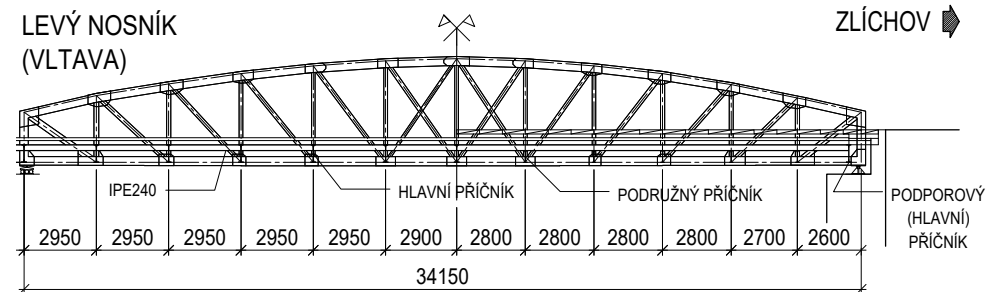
(a, b) Truss half-through bridge with upper parabolic chord (road bridge to Císařská louka from 1901)
